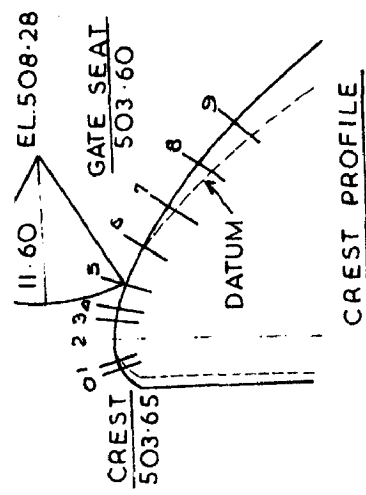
AMERICAN FALLS DAM CREST-PRESSURES
